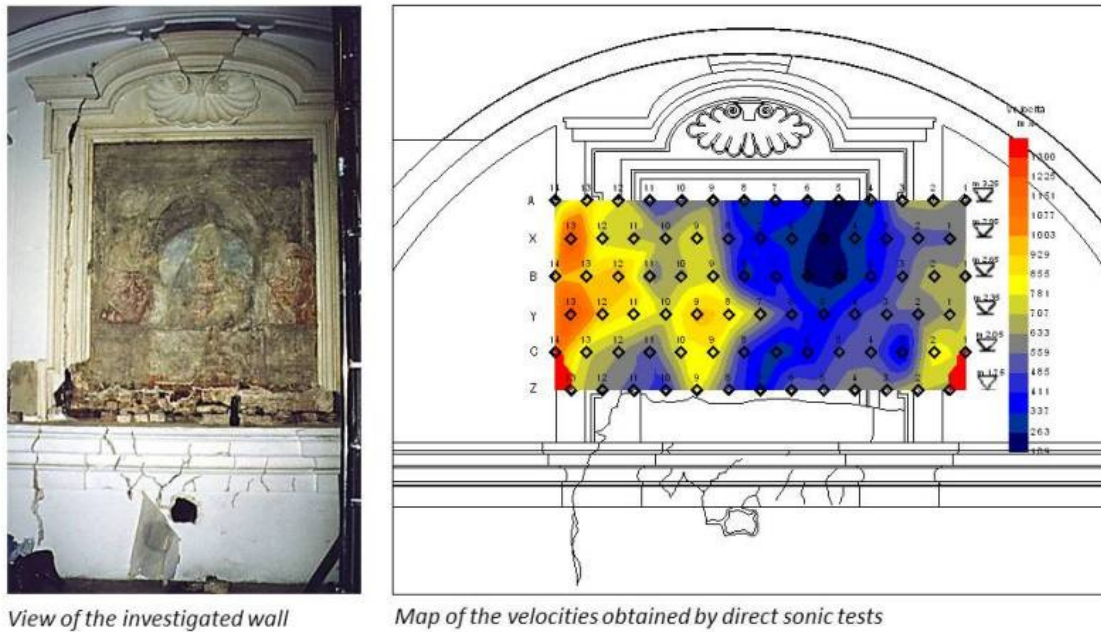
Detection of a hidden chimney in a historical masonry wall (picture, drawing and graph by the author).
